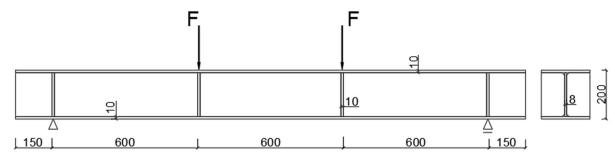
Stiffened Steel Girder Detail (all units are mm)
